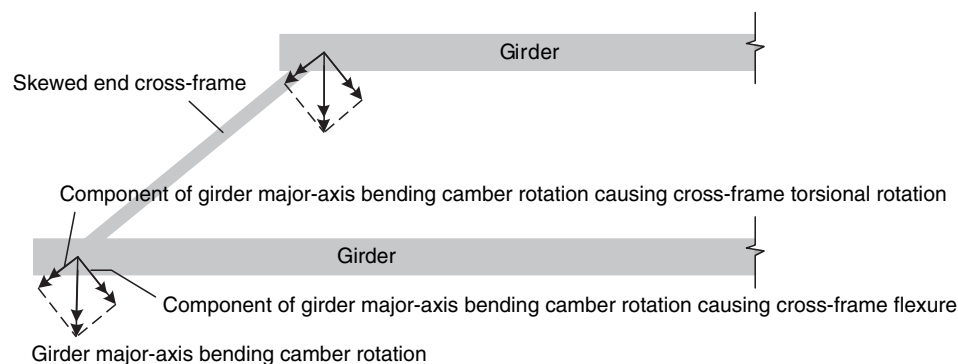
Flexural and torsional rotation components at the ends of a skewed end cross-frame due to the girder major-axis bending camber rotations.
